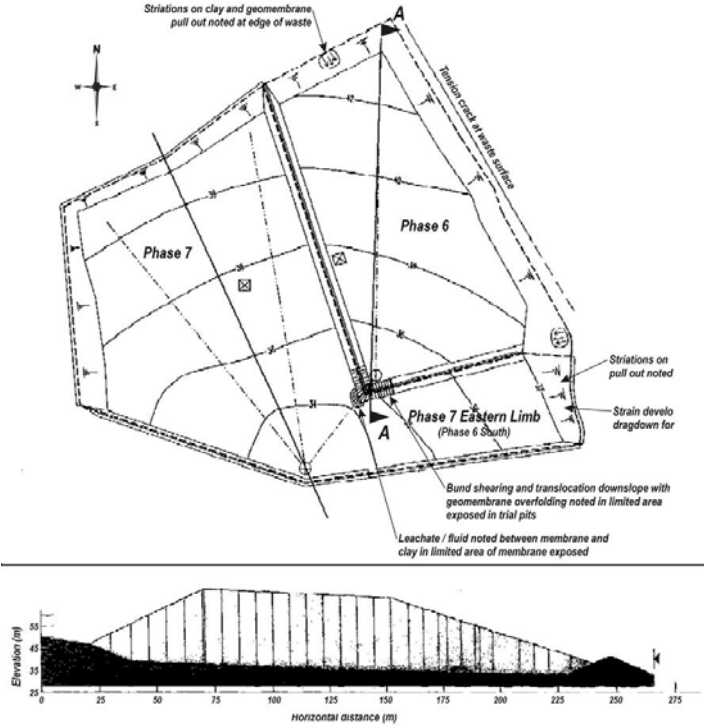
Plan and cross-section of Cells 6 and 7 of Case Study No 1
